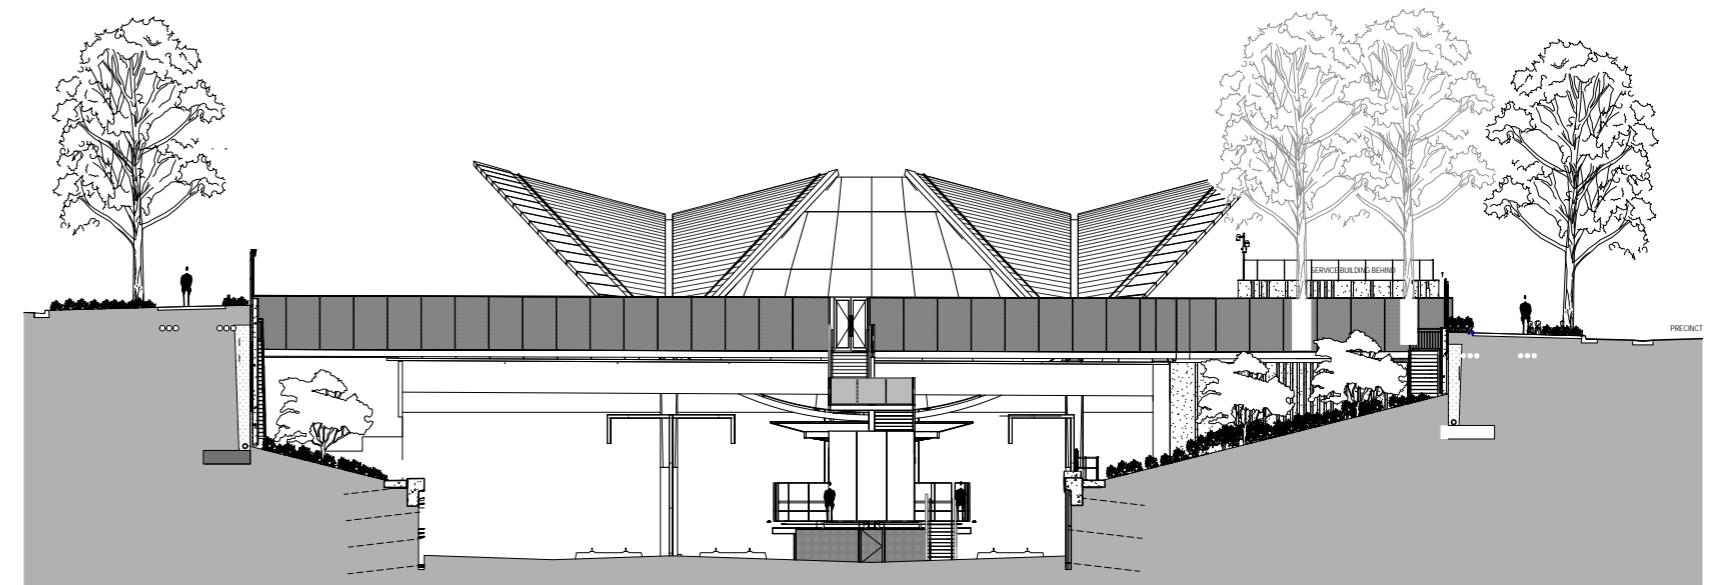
Section showing Pedestrian Bridge at Cudgegong Road Station. Source: HASSELL
